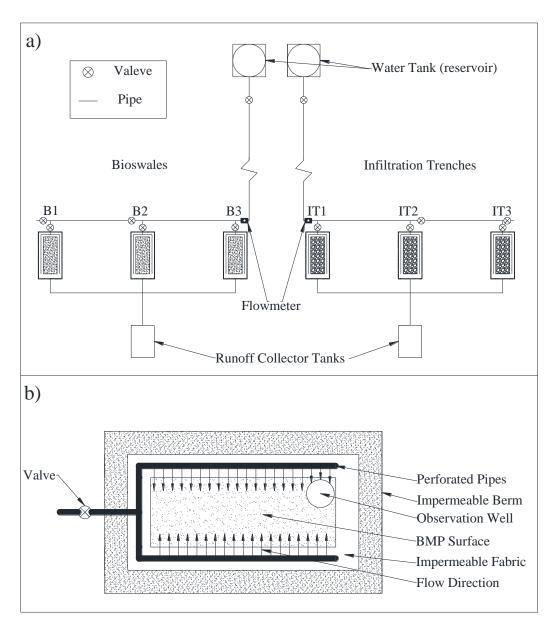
(a) Schematic plan view of the BMPs and test layouts; (b) magnified version of a representative cell.
